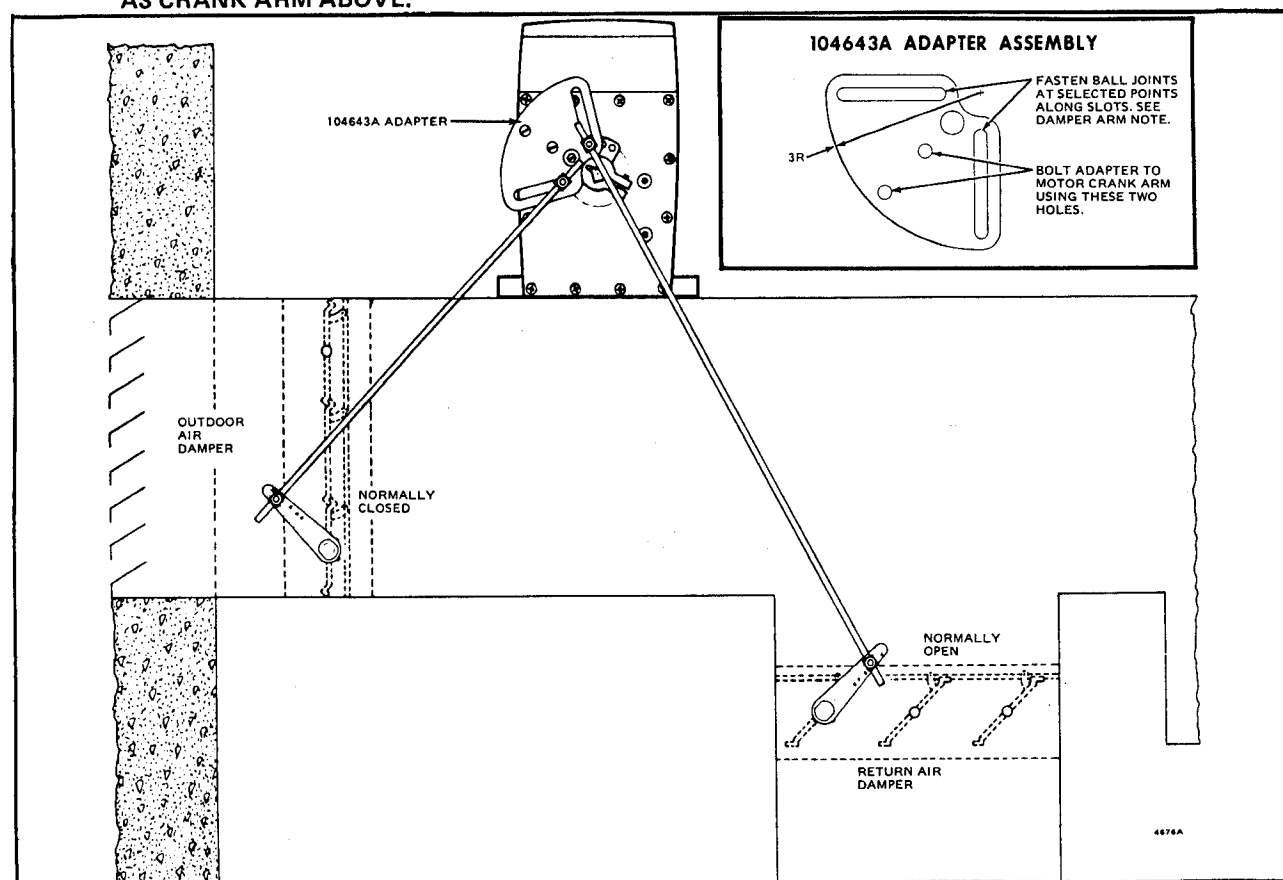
MOTOR MOUNTED EXTERNALLY ON THE DUCT TO CONTROL TWO DAMPERS ACTING AT RIGHT ANGLES. USE OF ADAPTER ASSEMBLY ELIMINATES ONE DAMPER ARM, AND ALSO MAKES POSSIBLE THE USE OF TWO PUSH RODS OF NEAR EQUAL LENGTH INSTEAD OF ONE SHORT ROD AND THE OTHER TOO LONG TO BE PRACTICAL.
